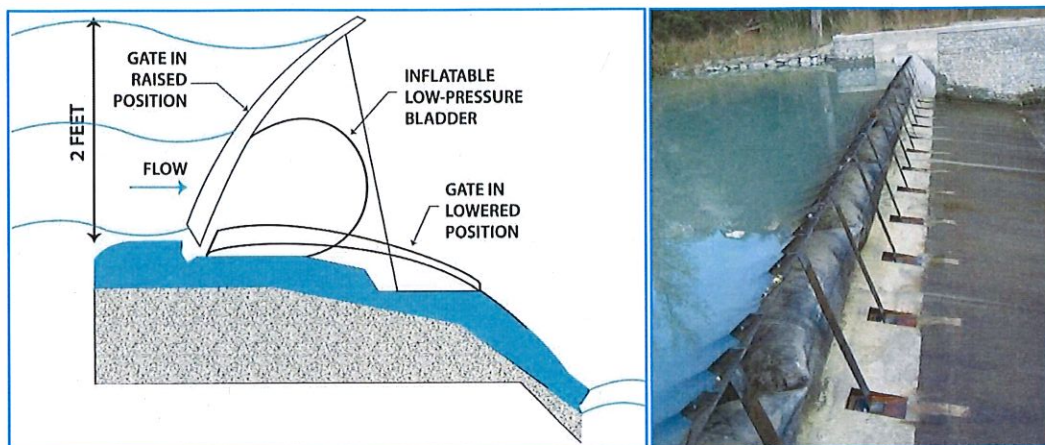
Obermeyer Spillway Gates diagram (left) and Installation in Uganda (right)
